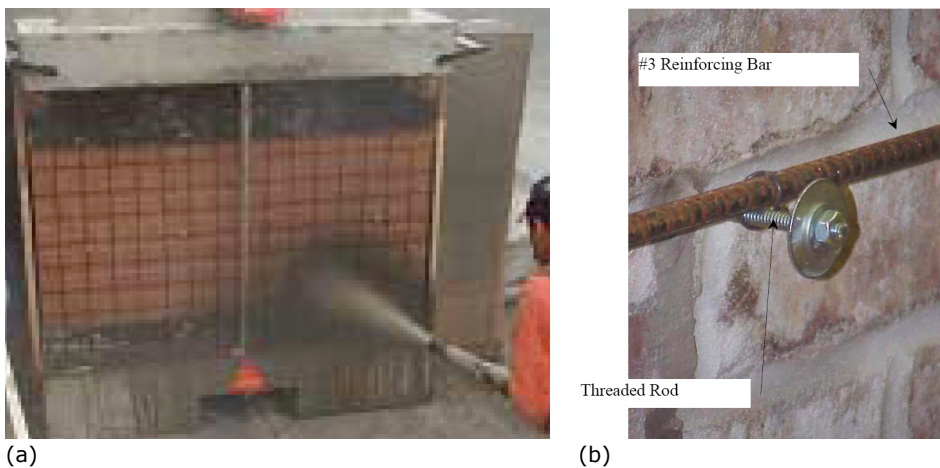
(a) Spraying shotcrete on masonry wall [62], (b) dowel to improve bonding [78]
